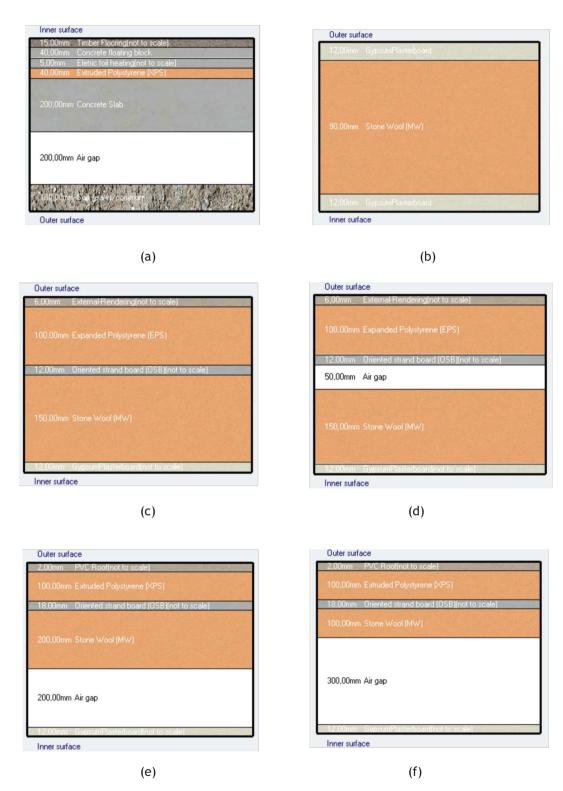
Envelope element layers (a) floor (b) internal partitions (c) external wall 01 (d) external wall 02 (e) roof 01 (f) roof 02. Source: Design Builder® files [5].
